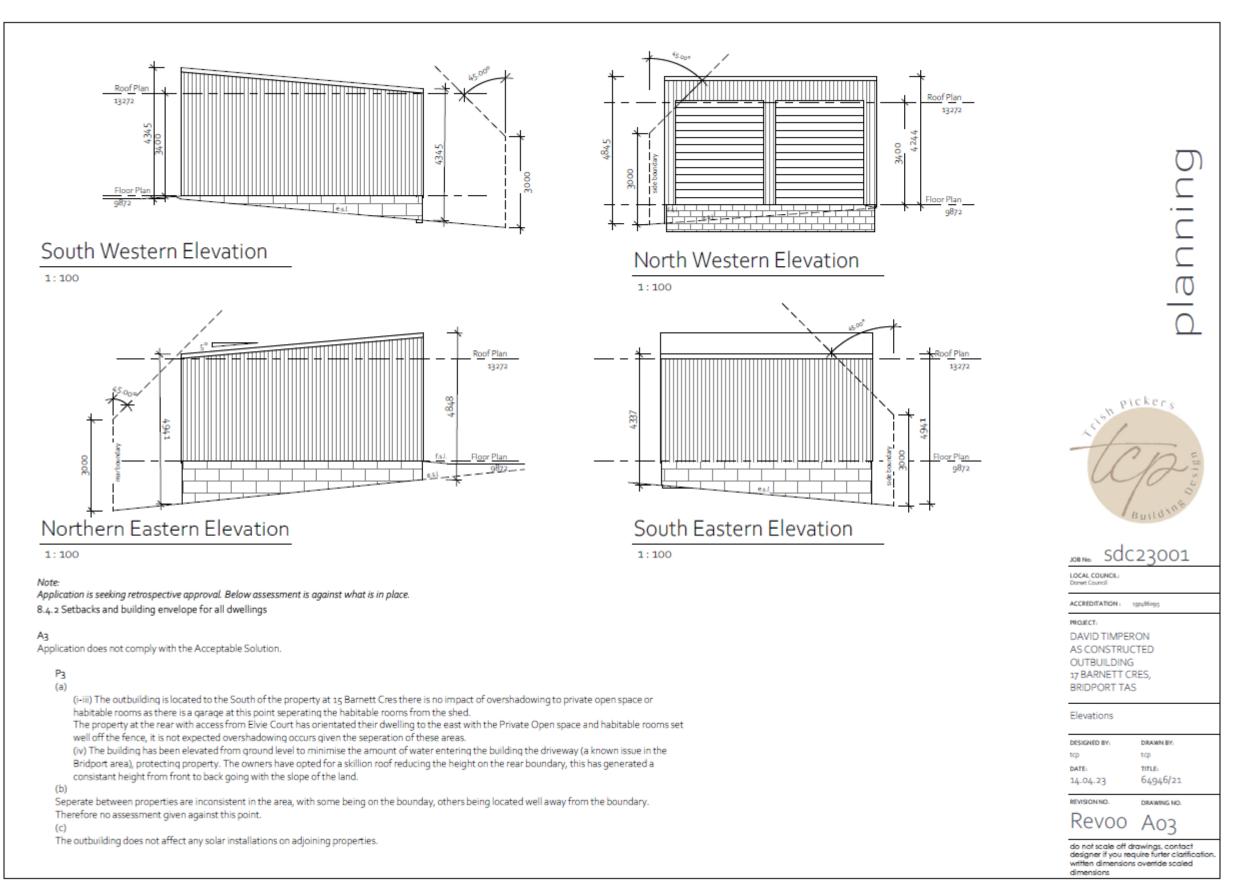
Elevation Diagram of the As-constructed Garage (source: TCP Building Design, 2023)
